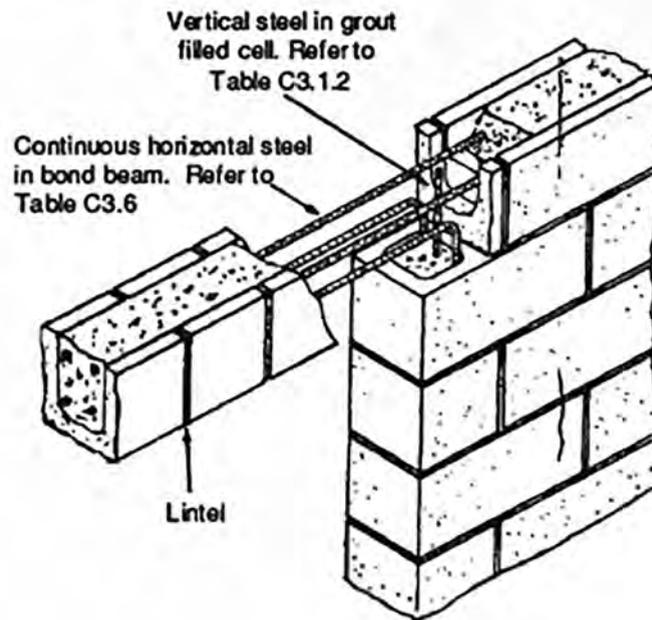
LINTELS AND BOND BEAM DETAILS
